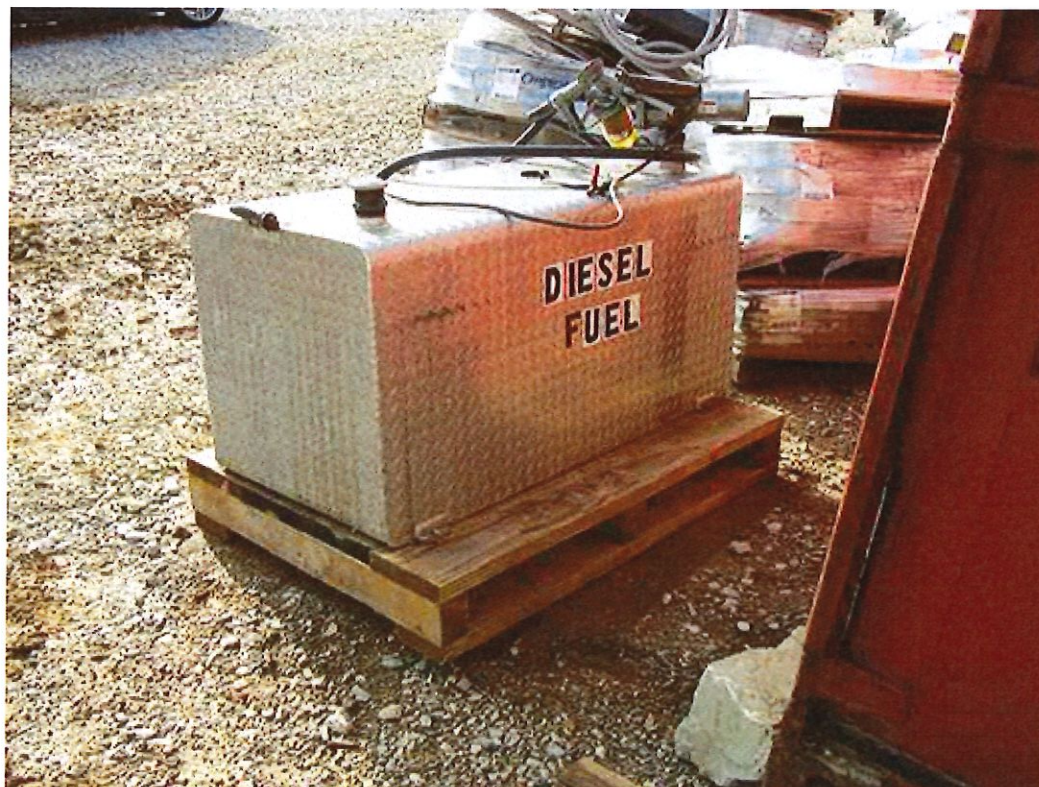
Inappropriately stored fuel tank. This tank should not be sitting, on a slant, on a pallet. There was also no spill kit available.
